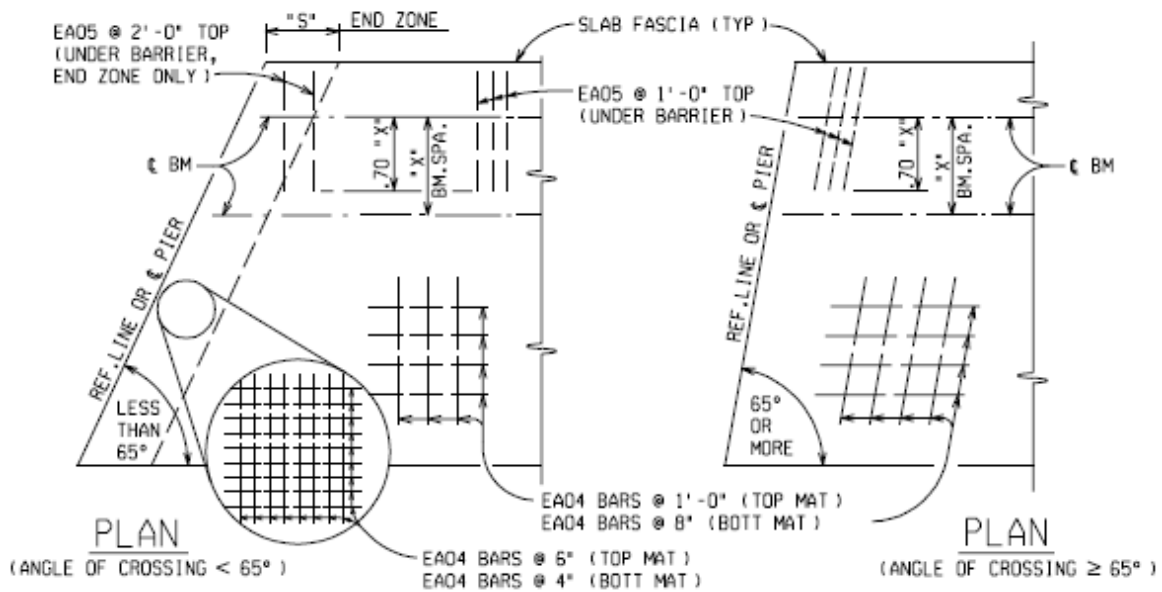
End zone reinforcement details (MDOT Bridge Design Guide 6.41.02)
